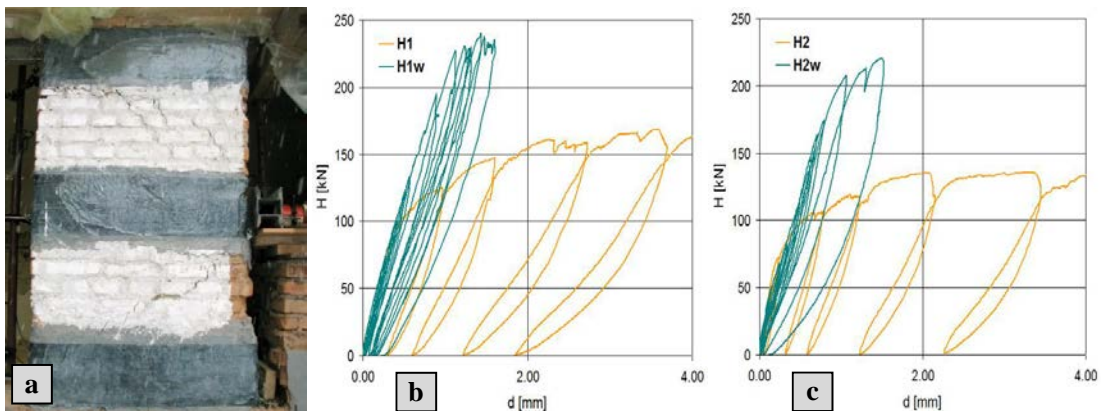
Shear damage of wall H2w (a), response of wall H1 and H1w (b), and response of wall H2 and H2w (c).
